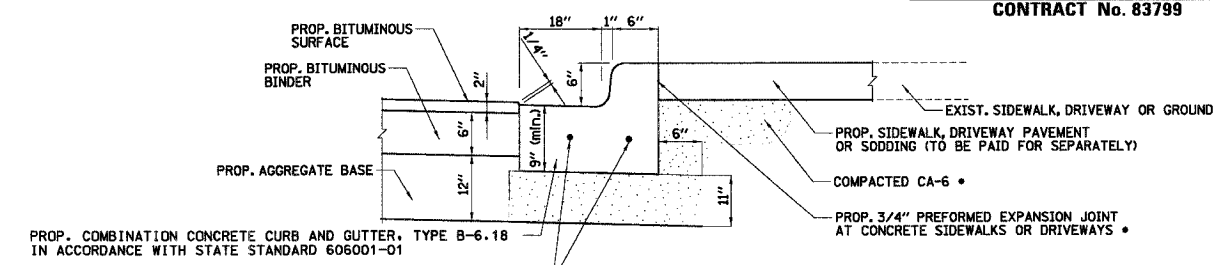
DETAIL OF CURB AND GUTTER AT STRUCTURE WITH TYPE 23 FRAME AND GRATE
